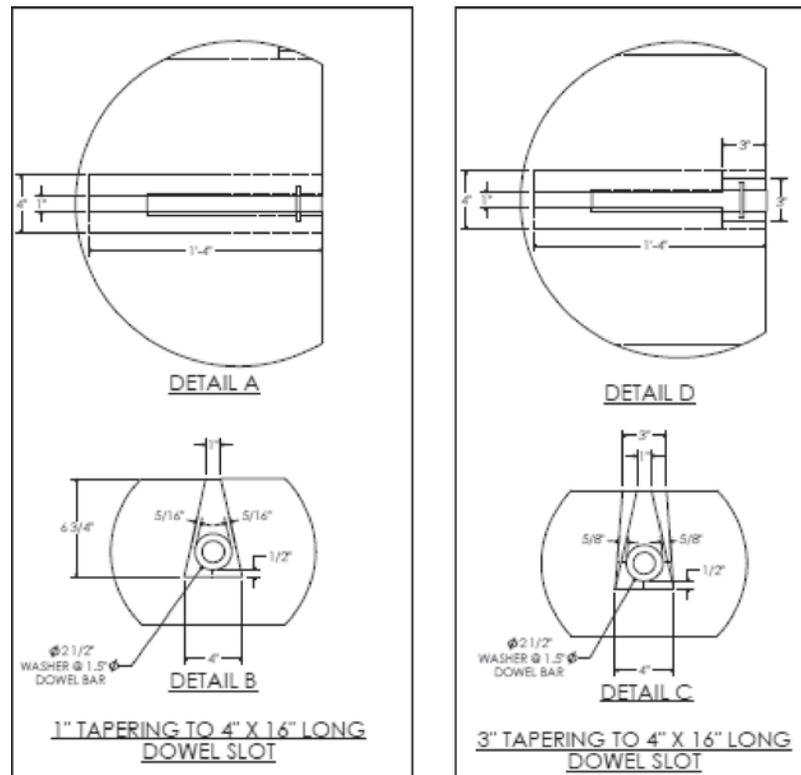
Details of the standard slot and of the standard slot with wider opening at the joint face.
